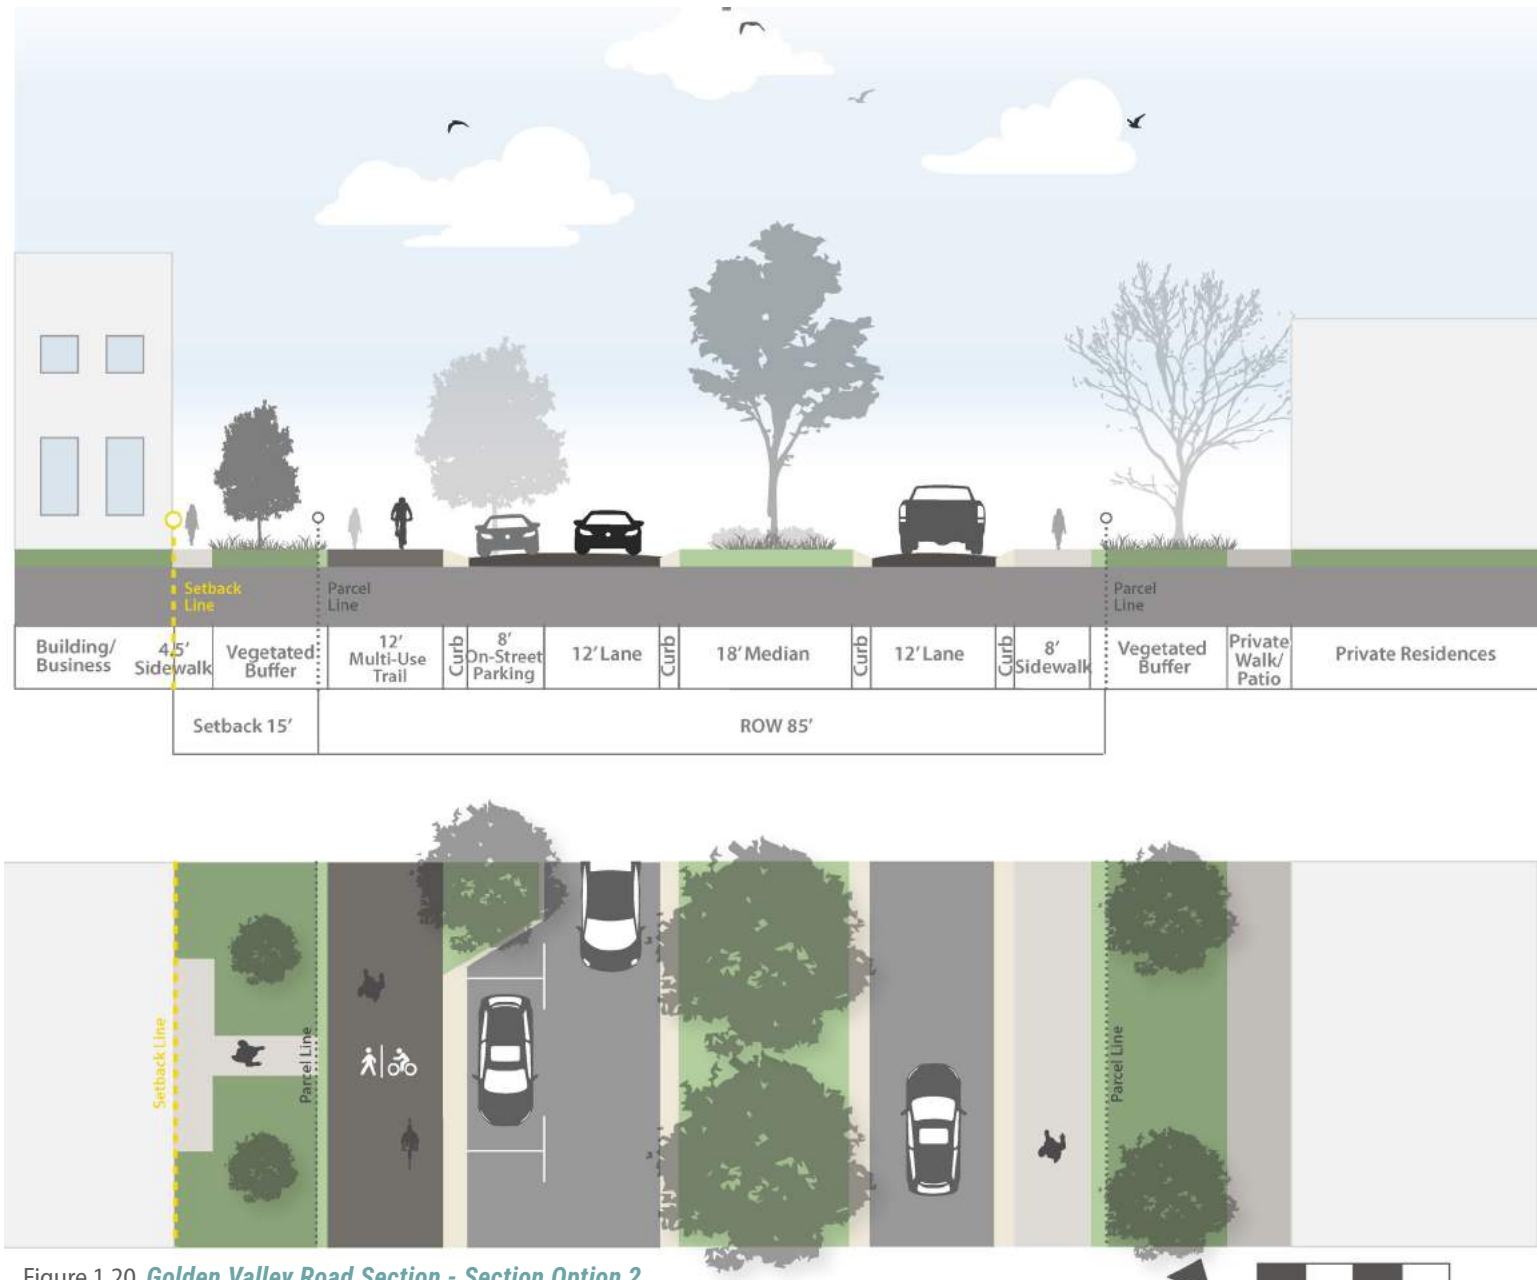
Golden Valley Road Section - Section Option 2
